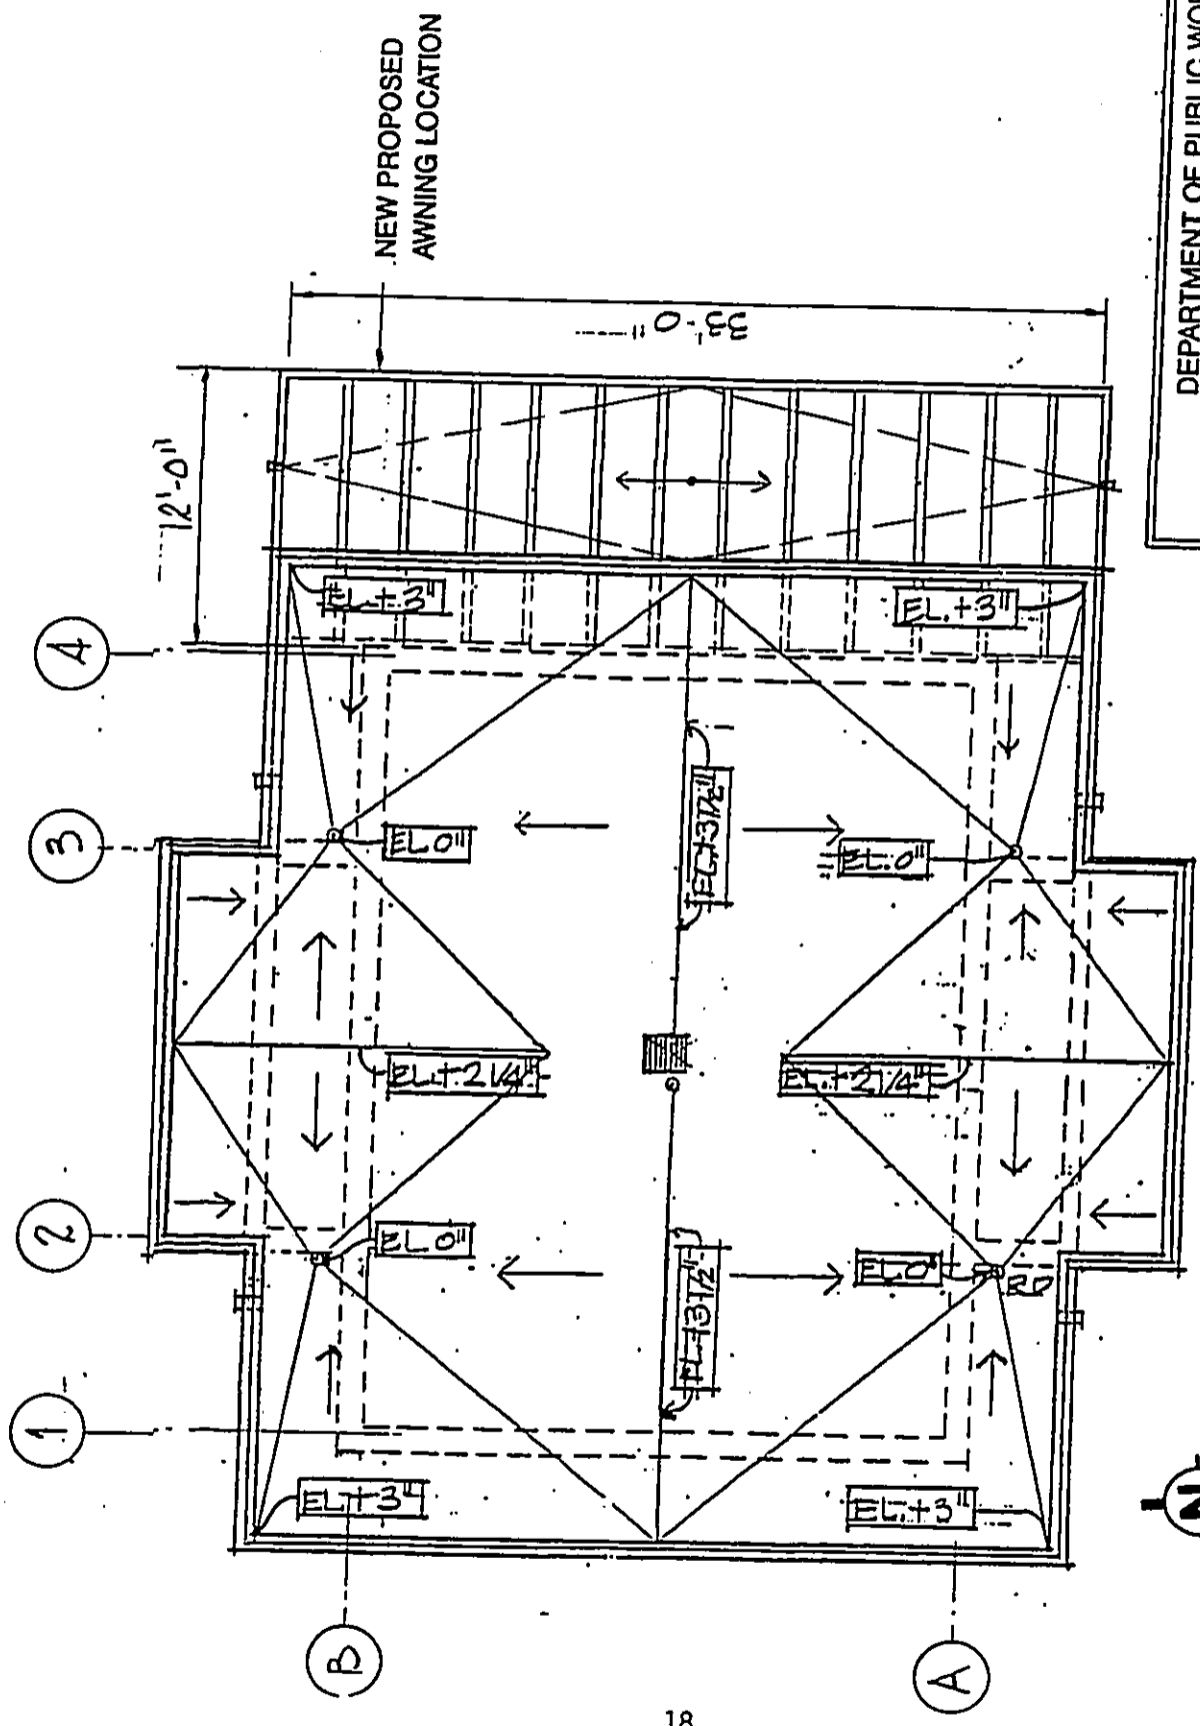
CONTROL BUILDING AT WAIANAЕ WWTР WHERE PROPOSED AWNING WILL BE INSTALLED OVER THE EXTERIOR STAIRWELL.
